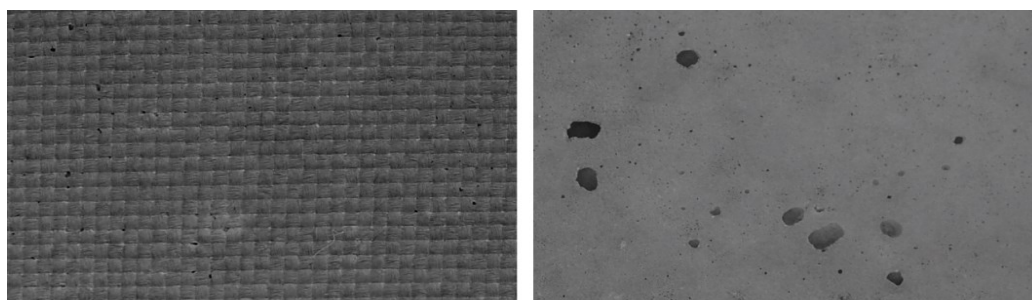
Comparison of concrete cast in a fabric (left) and timber (right) mould
